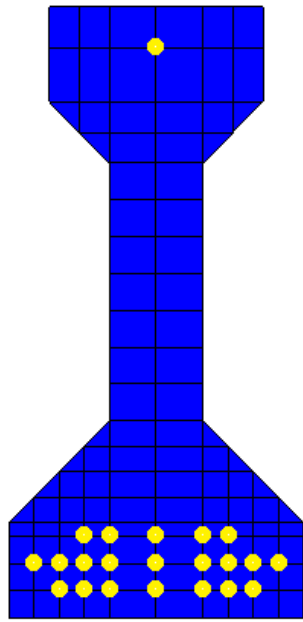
Span 1 and span 2 and 3 end section girders details and FE models
